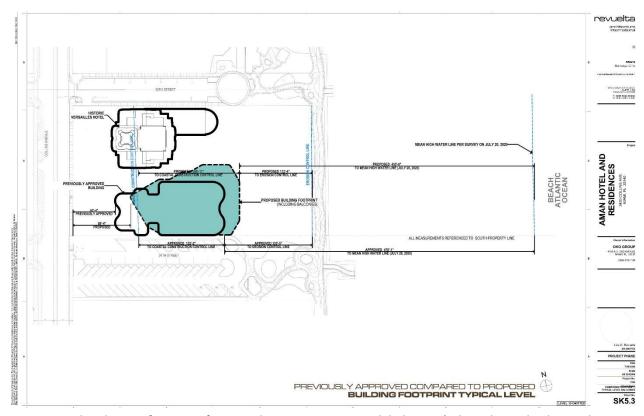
Plan showing footprint of proposed new construction with balconies (color-enhanced to better show proposed new construction), 7/30/2020.
